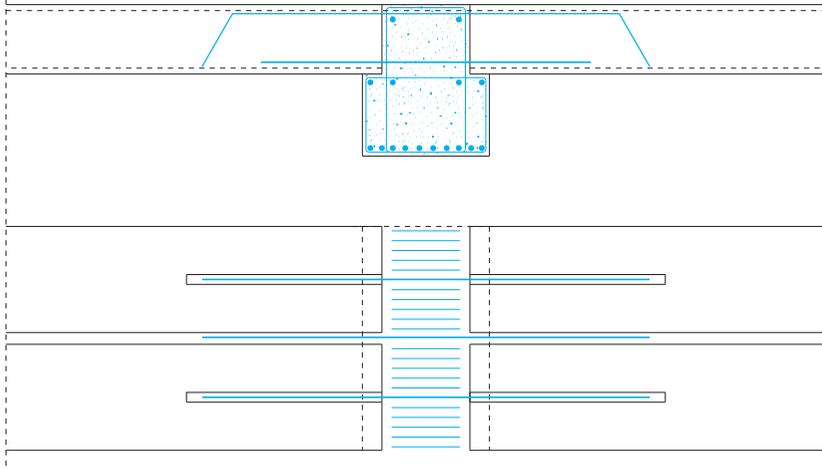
The floor-beam connection cast in situ with length of support of the floor.
